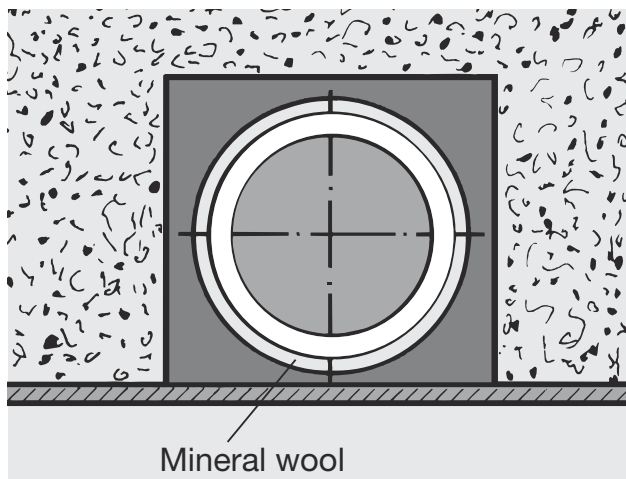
Pipe lagging to avoid sound bridges between pipe and plaster.
